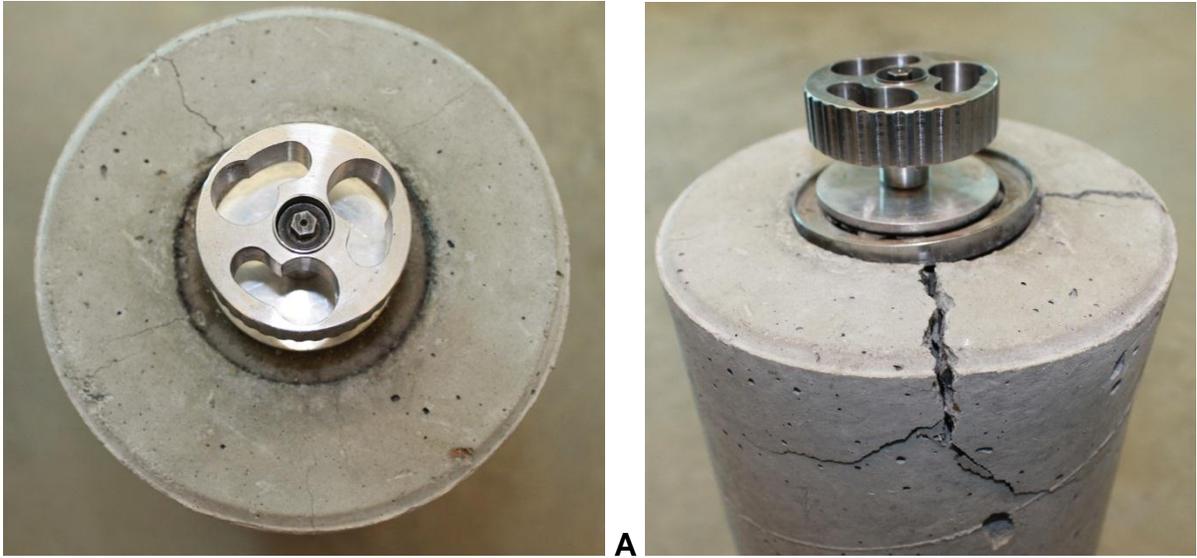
Radial cracking on cylinder due to pull force. A) Cracks at failure. B) Cracks at insert extraction. (photo courtesy of Adel Alsaffar)
